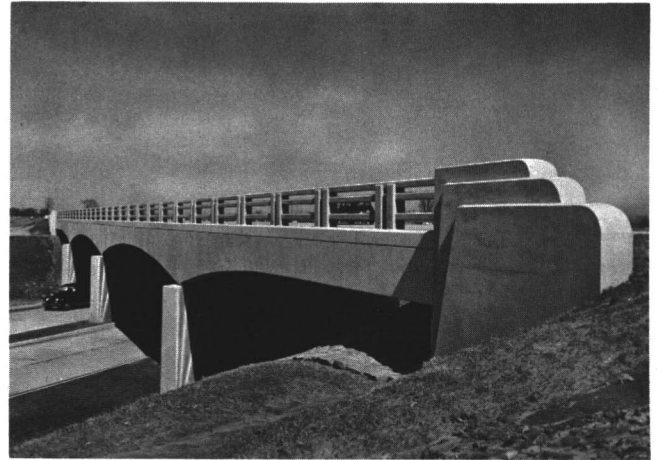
Use of concrete for all parts, including the handrails, is typical of grade-separation structures on the Detroit Industrial Expressway. Design: Michigan State Highway Department. Construction: L. A. Davidson, Lansing, Mich.
